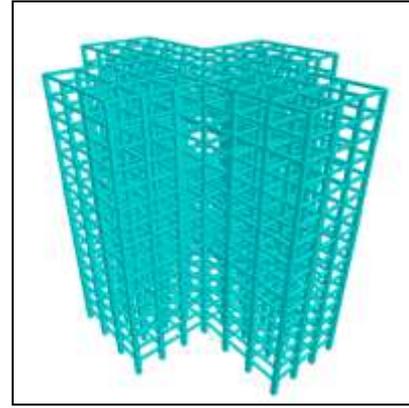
Plus Shape model 2 with arrangement of Bracing system
